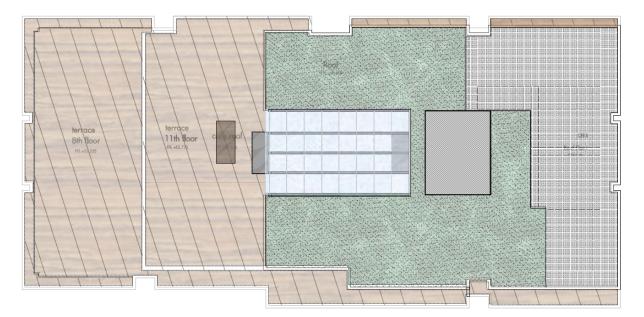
Proposed roof plan at B1 showing biodiverse roof (green area), terrace (brown area) and plant areas (in gray)
